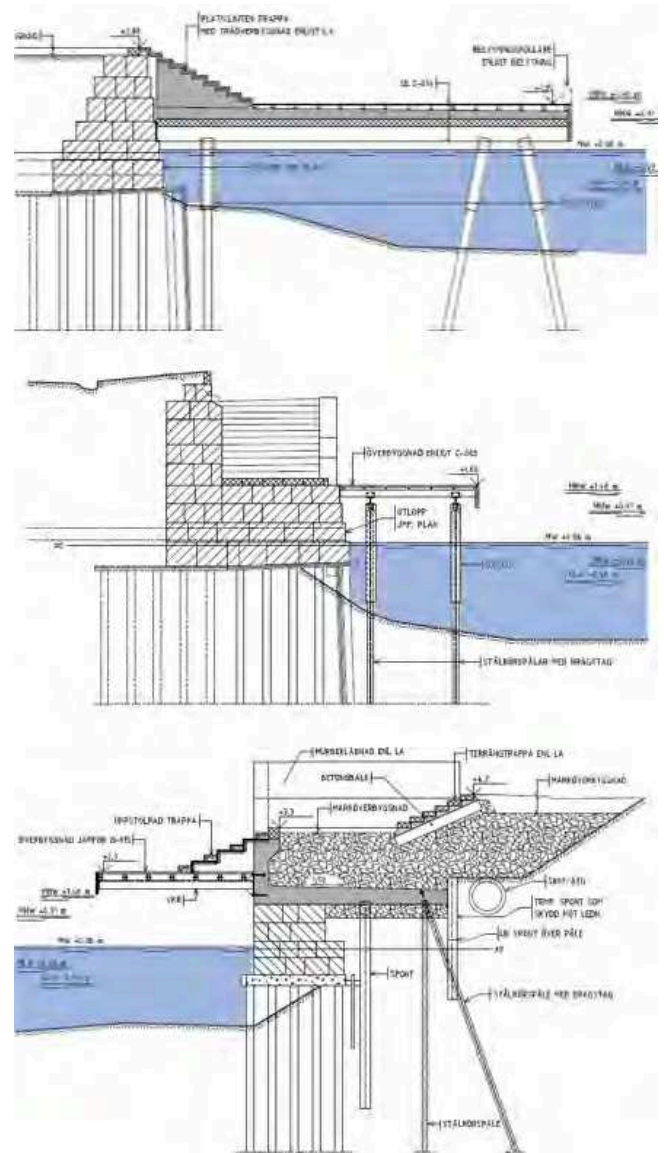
Three different pier types. Top: concrete slab founded on piles (pier 1). Middle: steel structures founded on piles (pier 3, 6, 7, 8 and 9). Bottom: suspended steel structures without contact with the riverbed (pier 2, 4 and 5).
